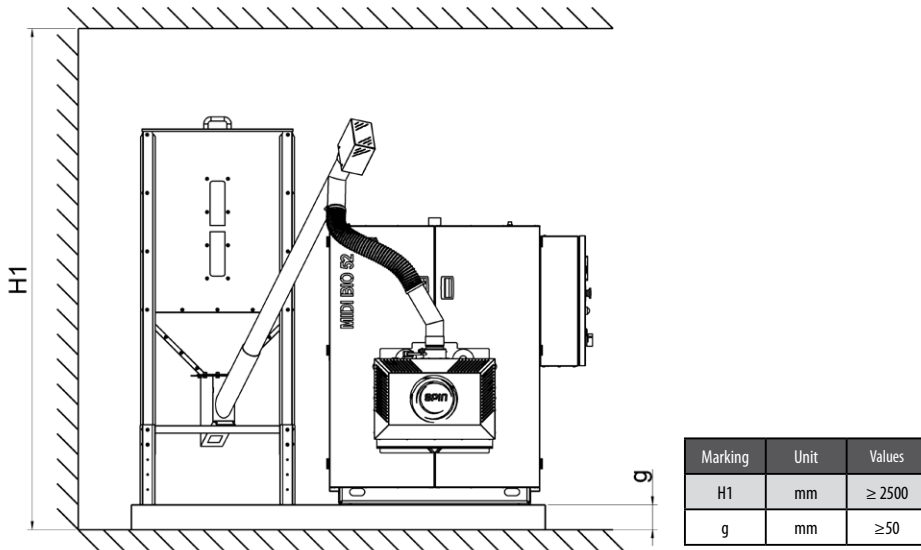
Boiler location in the boiler room - dimension diagram.
